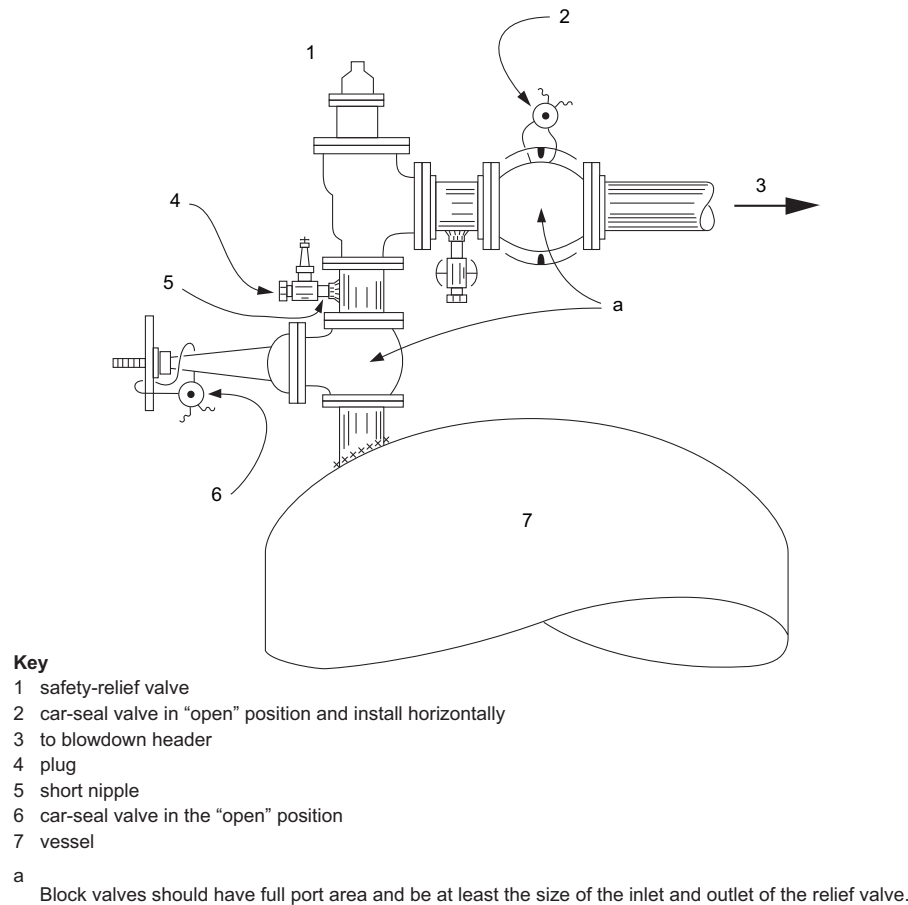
Block Valves on Safety-relief Valve Inlet and Outlet Sealed Open and Bleeders Installed to Depressure Inlet and Outlet
